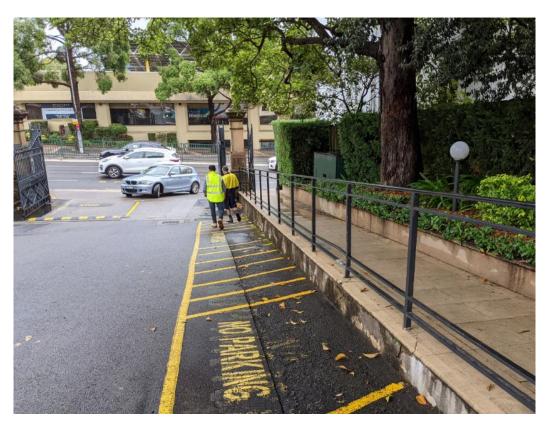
Main Entrance – New South Head Road access Source: Site visit (2021)
